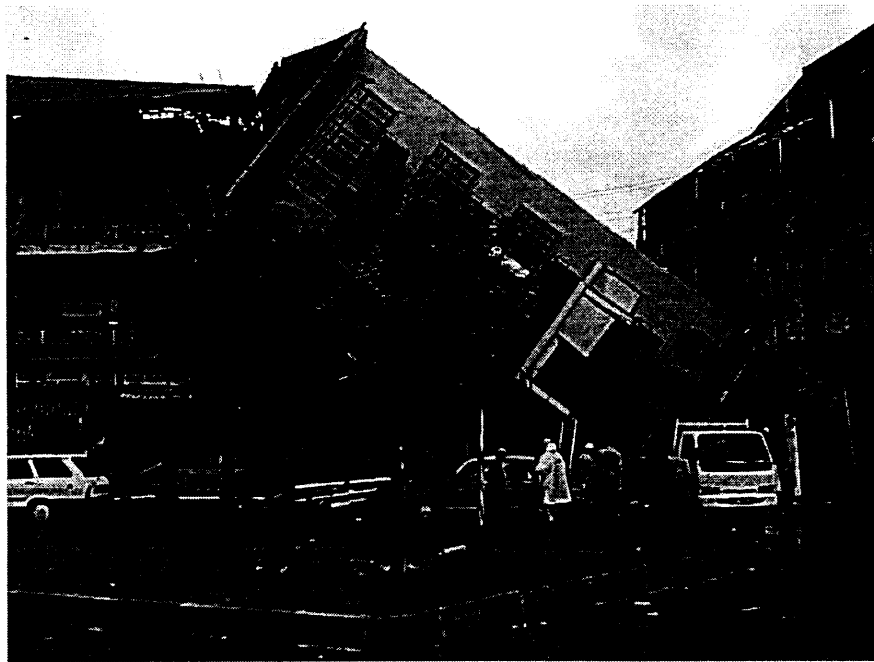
Photograph showing building B1 after it tipped over due to liquefaction of its foundation soil (from <http://peer.berkeley.edu/turkey/adapazari>).
